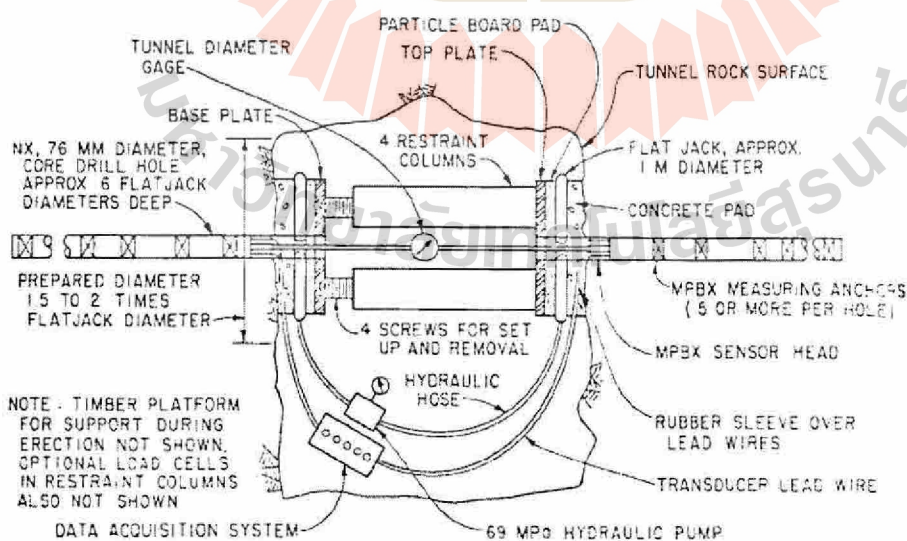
Typical Flexible Plate Bearing Test Setup Schematic
